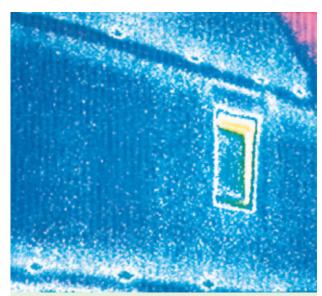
Infrared image of a cold bridge around the ceiling support.
